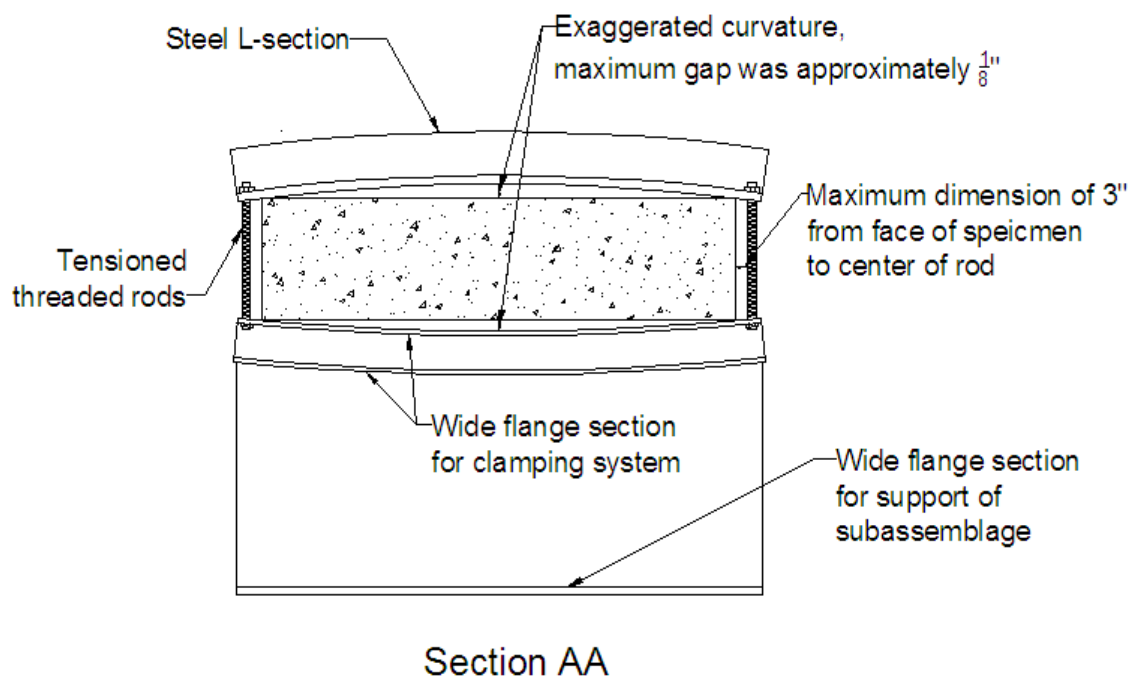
Section view of clamping assembly and subassembly specimen, parallel to joint, illustrating exaggerated curvature of L-section (top) and wide flange section (bottom) due to eccentricity of tensioned threaded rods
